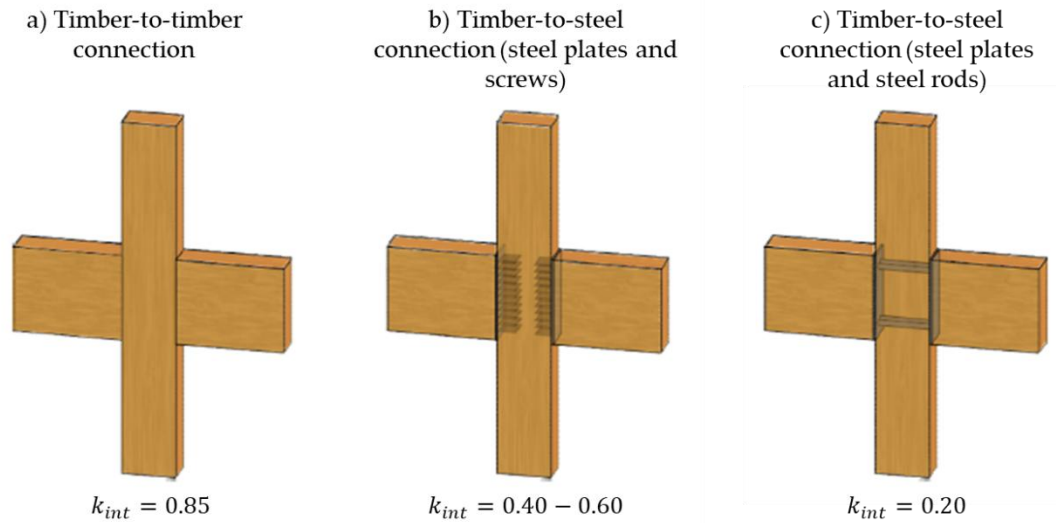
$k_{int}$  values for alternative reinforcements of the beam-column joint. a) timber-to-timber connection, b) timber-to-steel connection using steel plates and screws, and c) timber-to-steel connection implementing steel plates and steel rods. Modified after Smith et al., 2014.
